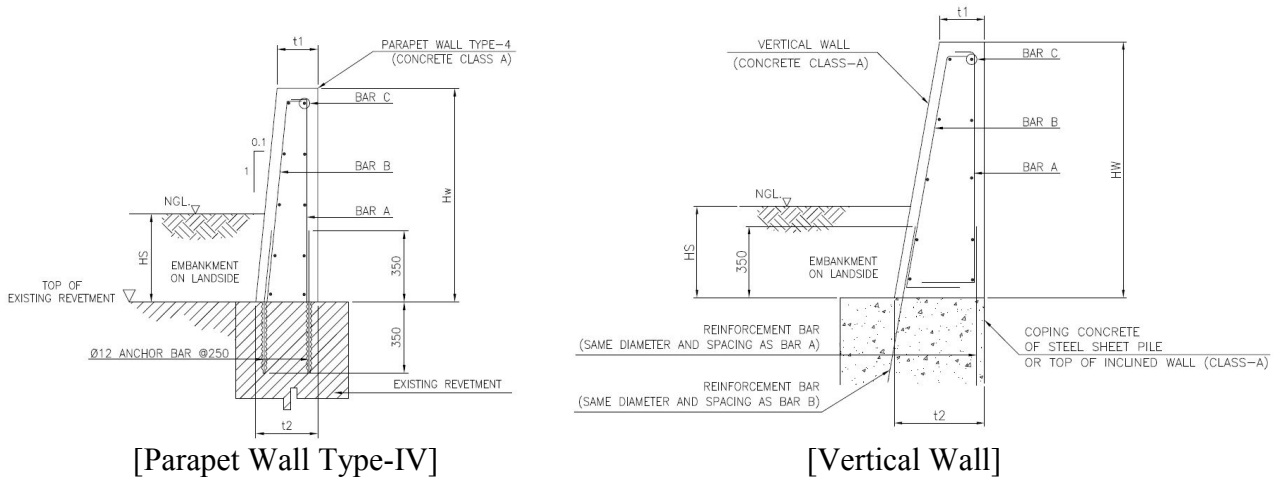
Typical Cross Section of Parapet Wall Type-IV and Vertical Wall
